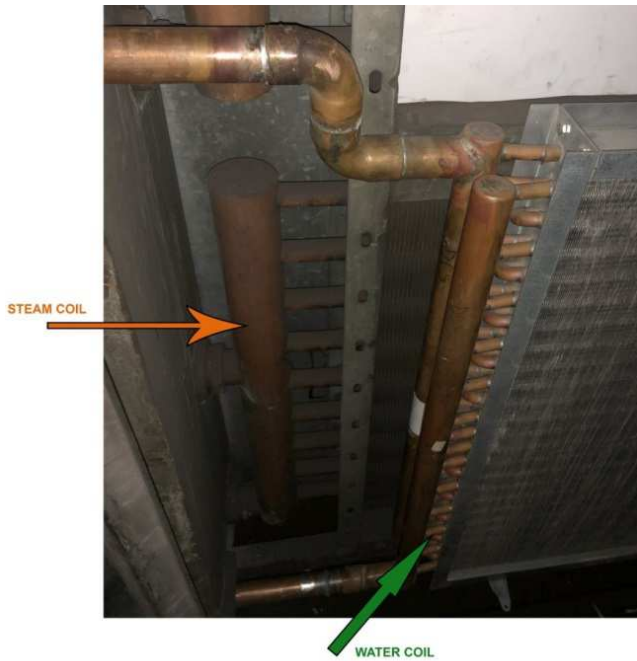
Steam and Hot Water Coils of the Unit Heater.
